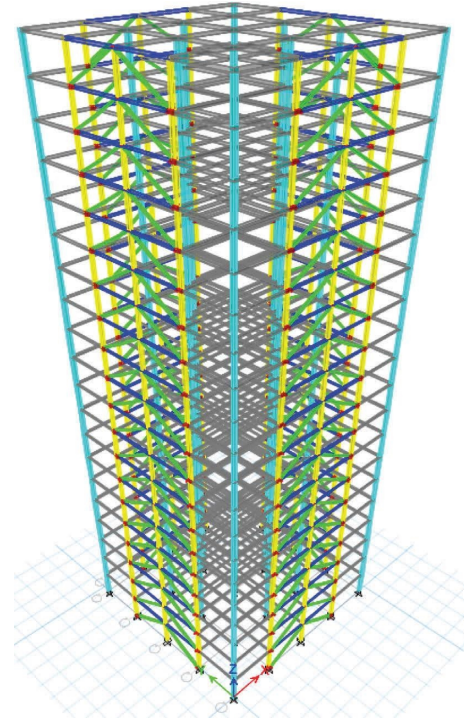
3D layout of the 20-storey structure with EBF bracing.
